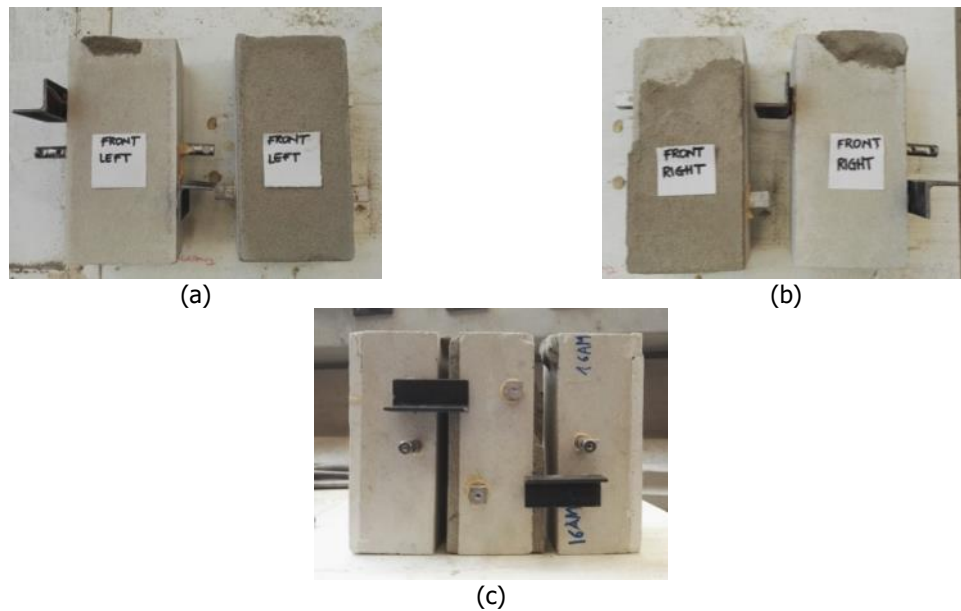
Crack pattern of standard triplets under shear test: (a) front-left joint; (b) front-right joint; (c) front view.
